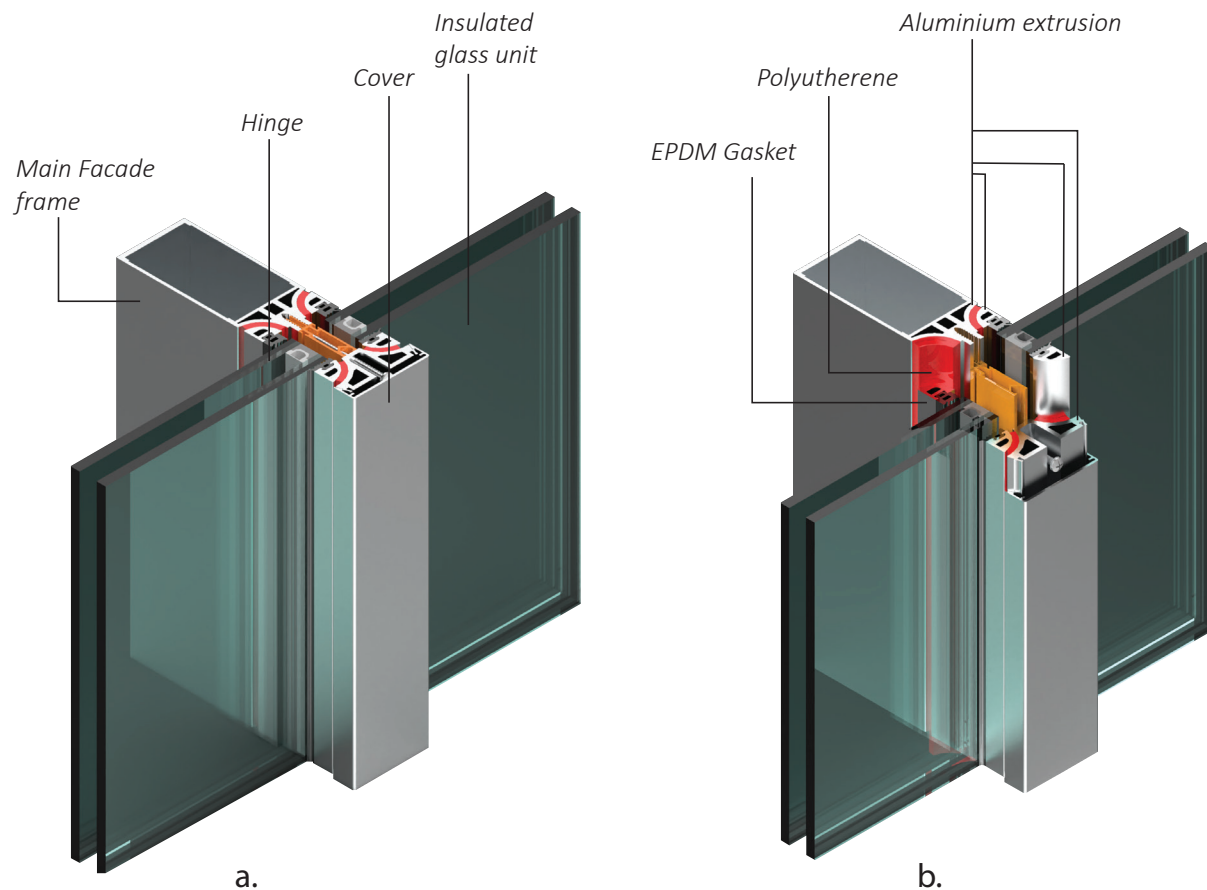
a. over all construction of proposed façade section to accommodate edge rotation. b. component break down showing the working of the hinge that accommodates edge rotation
